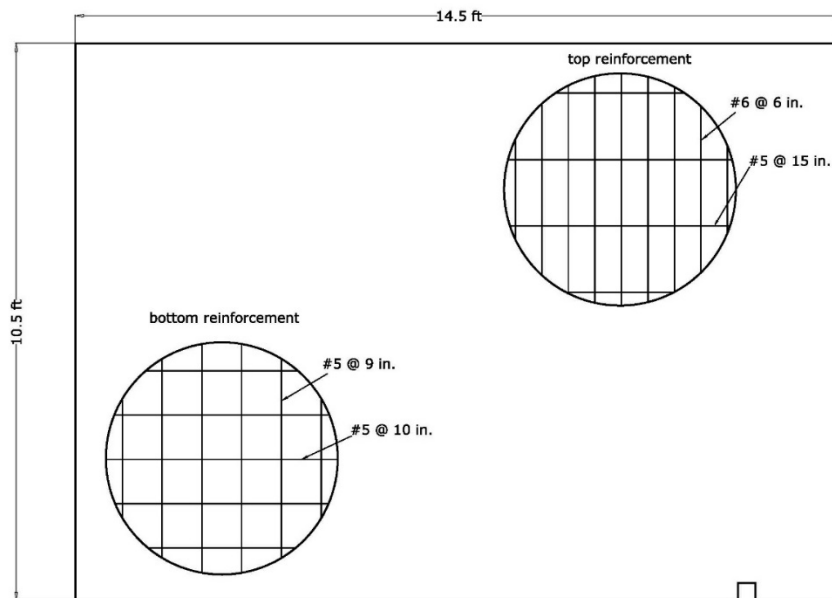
Details of the top and bottom layers of reinforcement steel in the concrete specimen.
